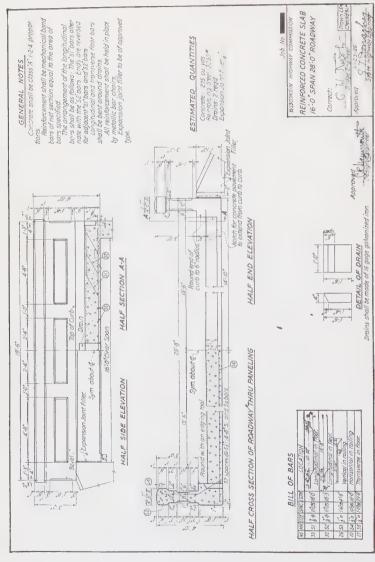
Plans for a reinforced concrete slab of sixteen-foot span and twenty-eight foot roadway.
